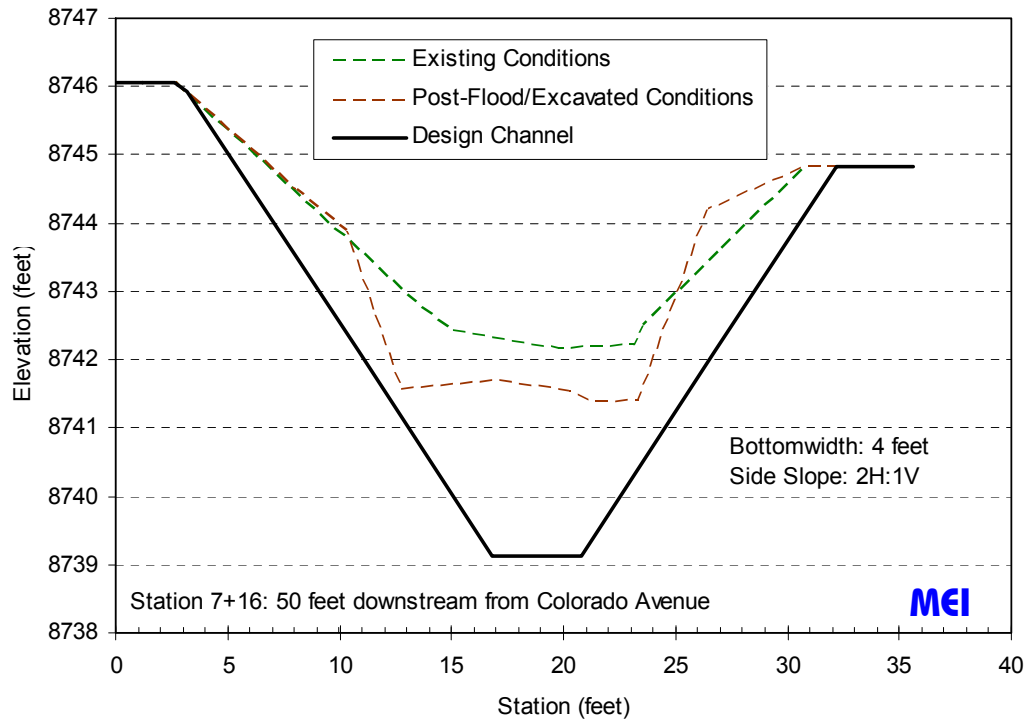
Cross-sectional schematic showing existing and post-flood/excavated conditions channel and channel design template at Sta 7+16.
